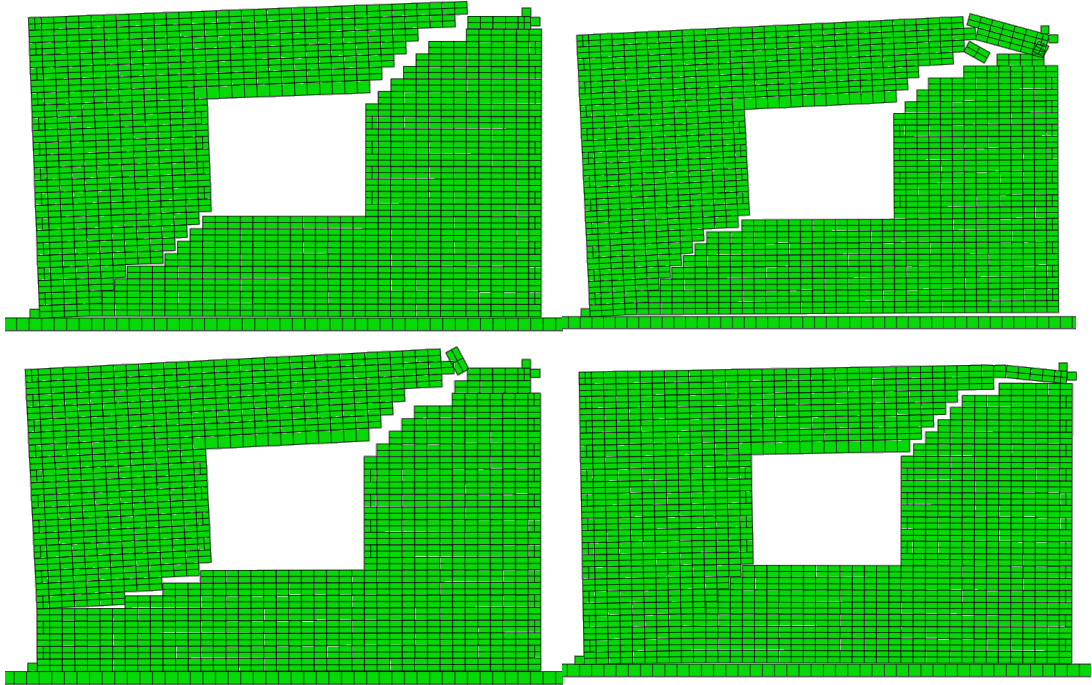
Numerical models for glued wall with opening (deformed geometry)
